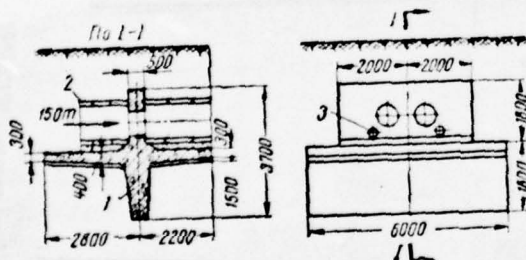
Fixed support from monolithic reinforced concrete. 1 - support; 2 - channel; 3 - drain hole.
